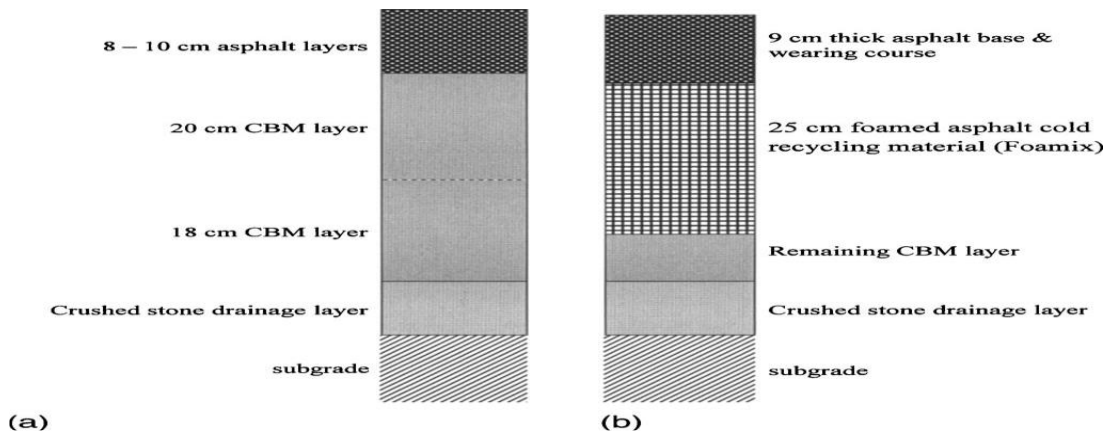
(a) Semi-rigid pavement before rehabilitation; (b) recycled pavement structure [101]
